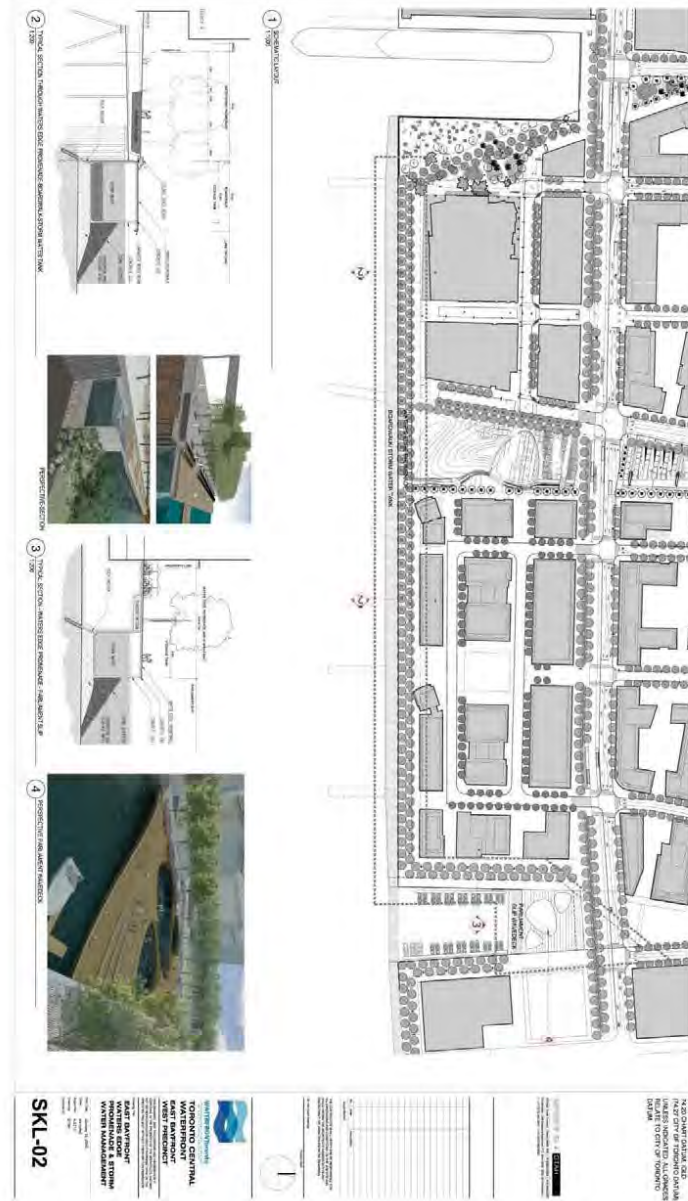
Waters Edge Promenade and Stormwater Management System
